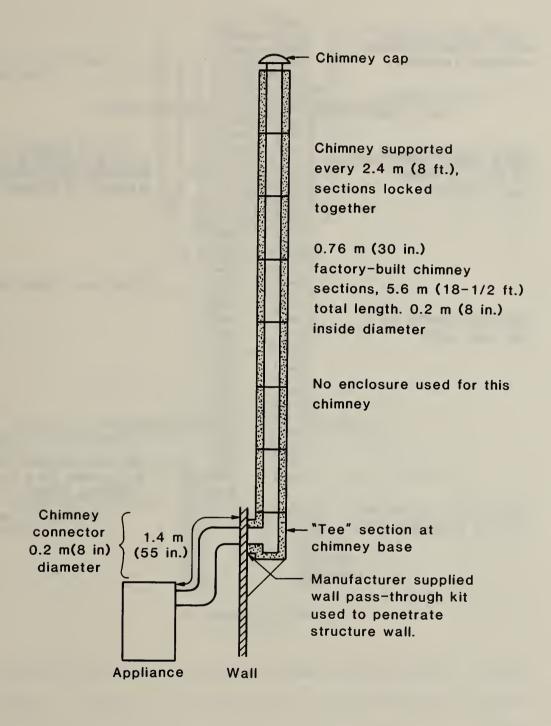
Installation of Factory-Built Chimney 5 for Chimney Fire Tests.
